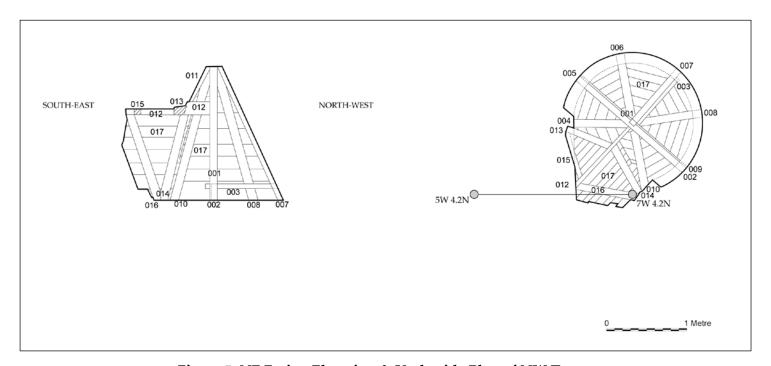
NE Facing Elevation & Underside Plan of NW Turret
